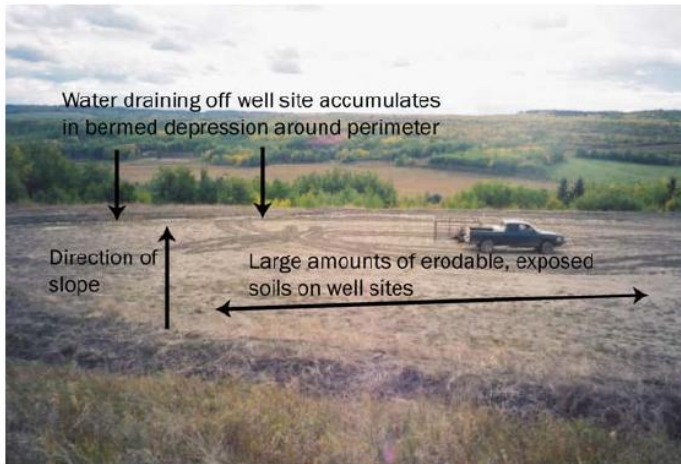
Exposed soils on oil and gas wellhead site. Note water retention ditch surrounding down-slope perimeter.
